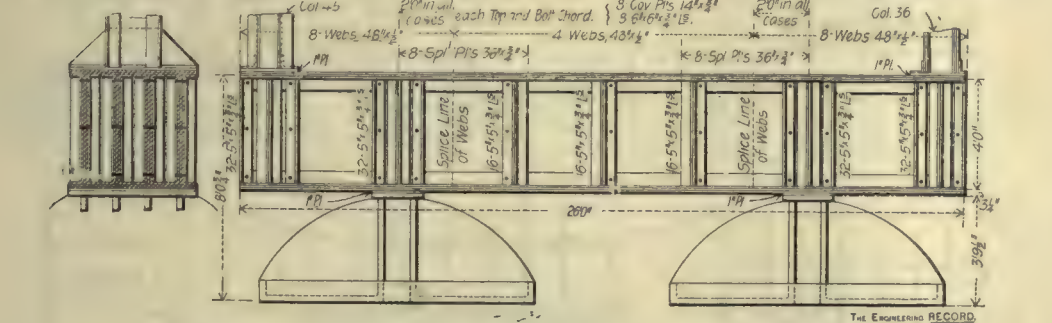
TRANSVERSE SECTION AND SIDE ELEVATION OF CANTILEVER L.
